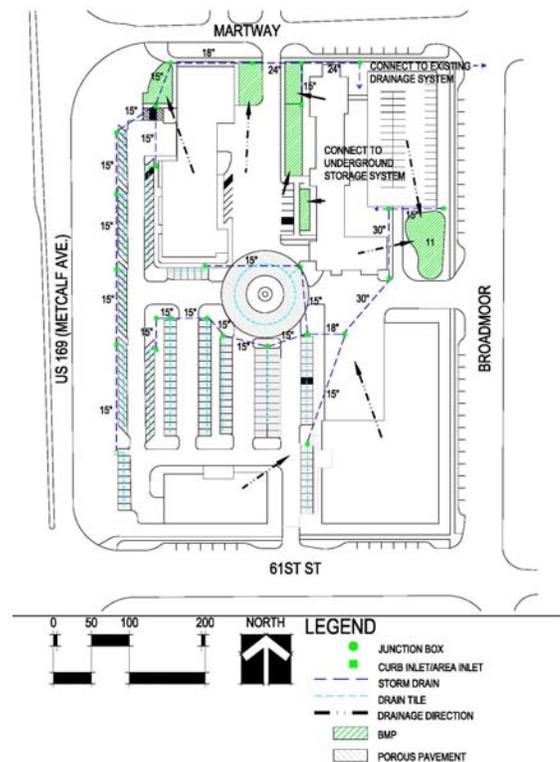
Metcalf Avenue Mixed- Use LID Layout
